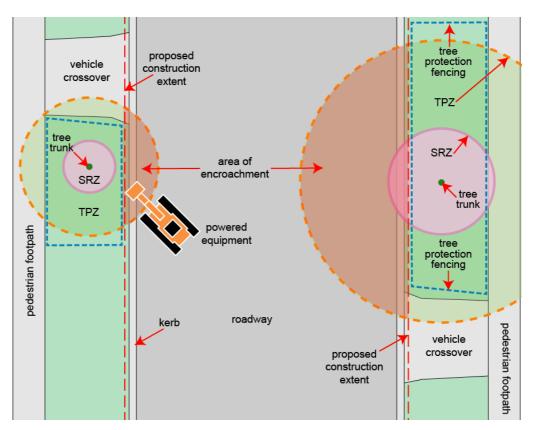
Example location of tree protection fencing in relation to proposed works and existing site characteristics as well as location of powered equipment. Note that powered equipment, where possible, should be located on existing hard paved surfaces with the bucket closest to the tree.
